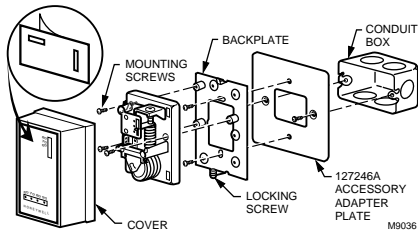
Vertical mounting of T921A Thermostat on vertical conduit box. Thermostat can also be mounted horizontally on horizontal conduit box using add-on faceplate.
